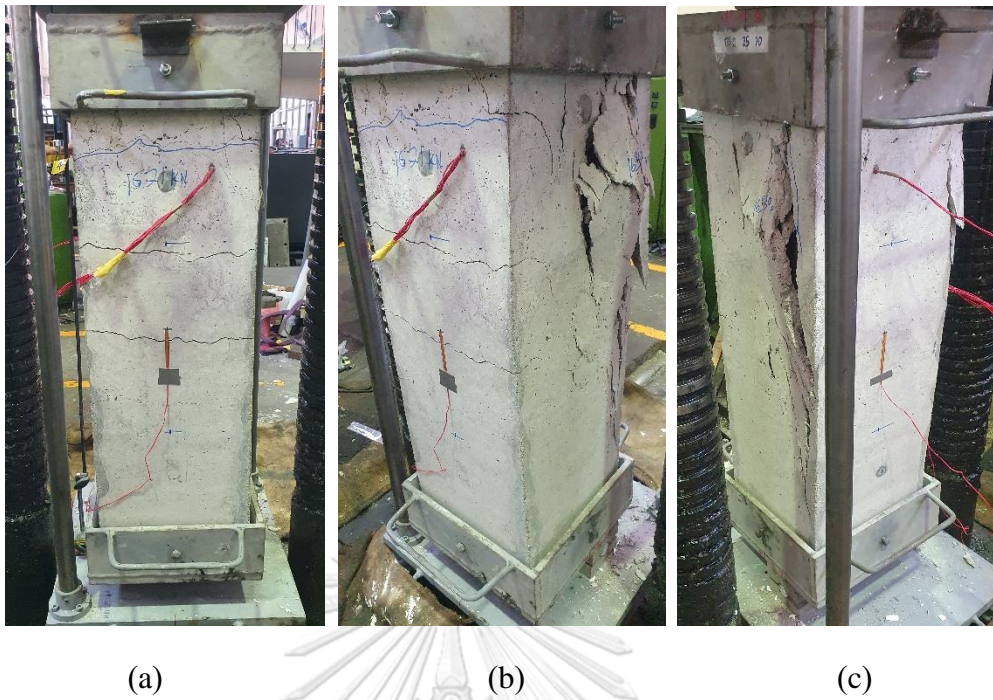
Failure of CECS column C1s-63-E2; (a) tension side; (b) side view; and (c) compression side.
